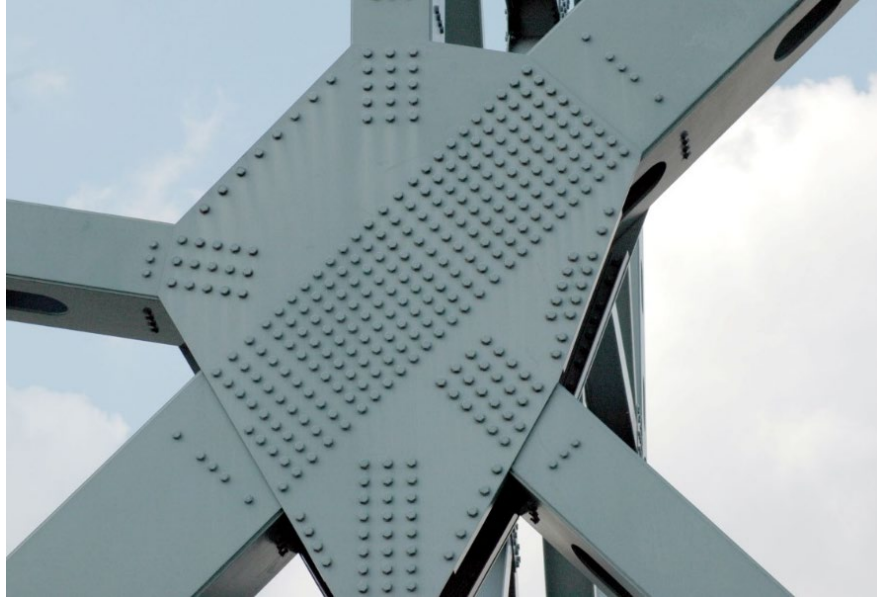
Odd-Shaped Gusset Plate Connecting Primary Truss Members
